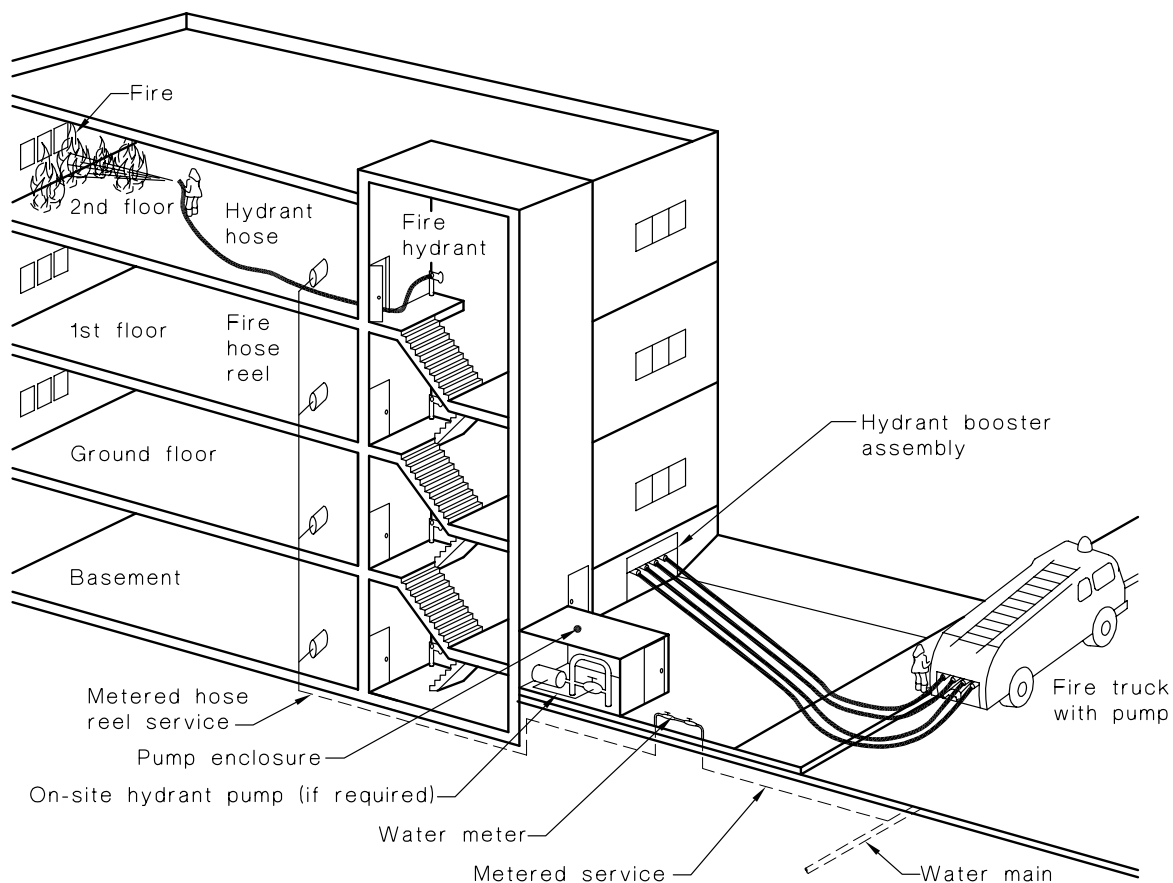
EXAMPLE OF BOOSTER ASSEMBLY WITHIN EXTERNAL WALL OF A BUILDING
